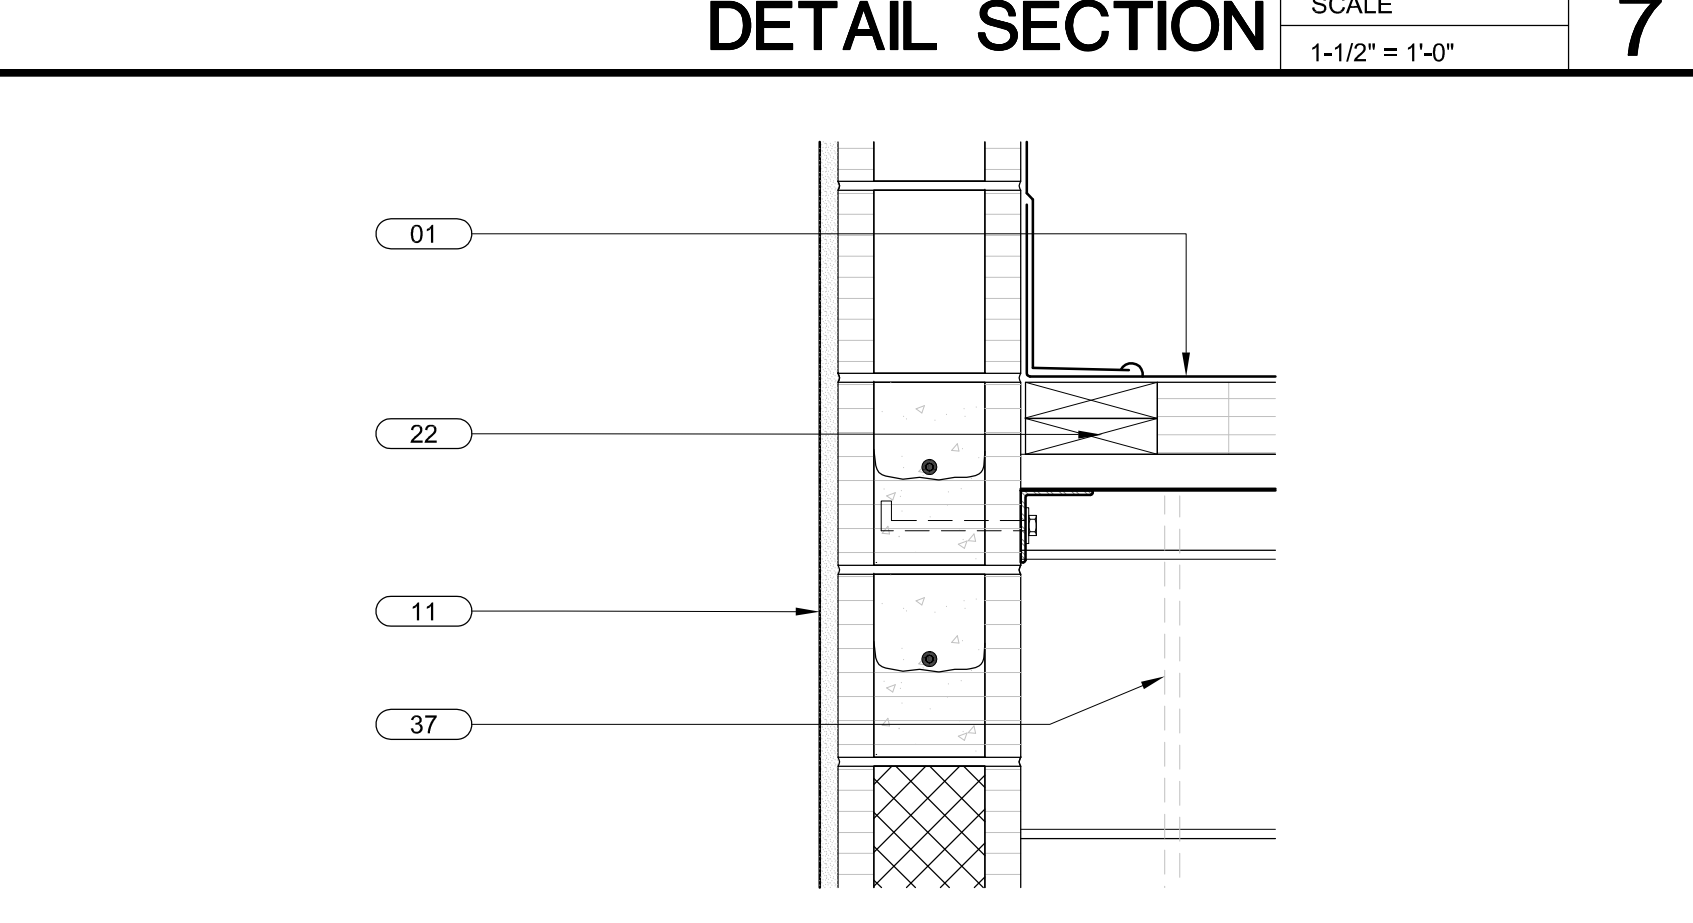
DETAIL SECTION SCALE 1-1/2" = 1'-0" 9
